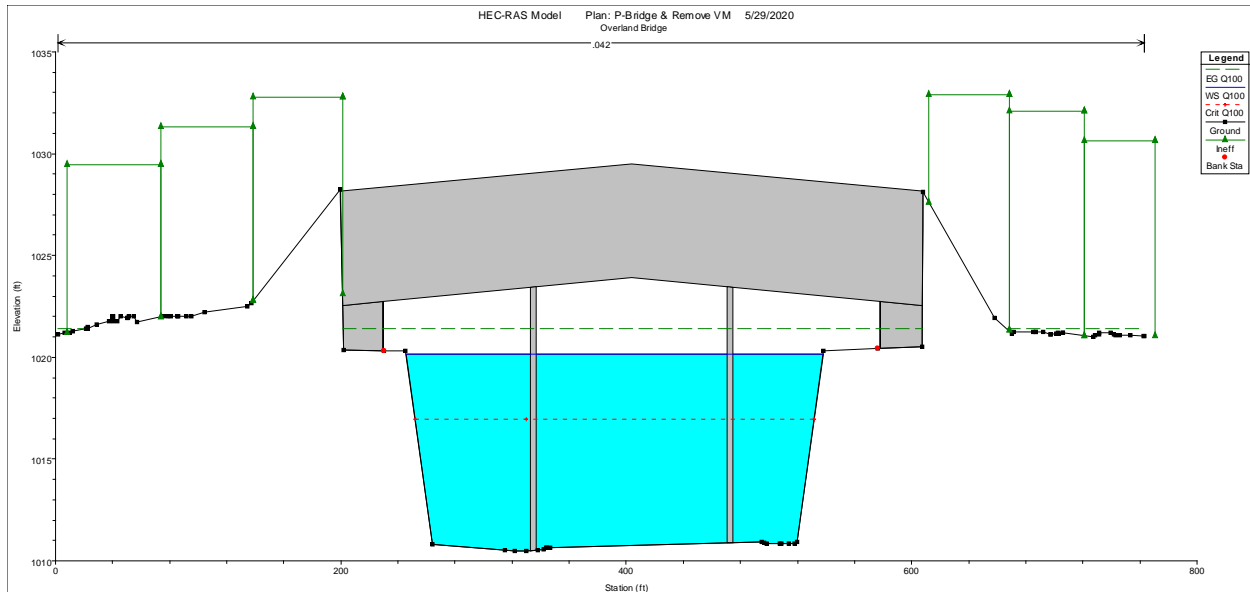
Water Surface Elevation at the upstream Bridge Cross Section for Model S-3.
